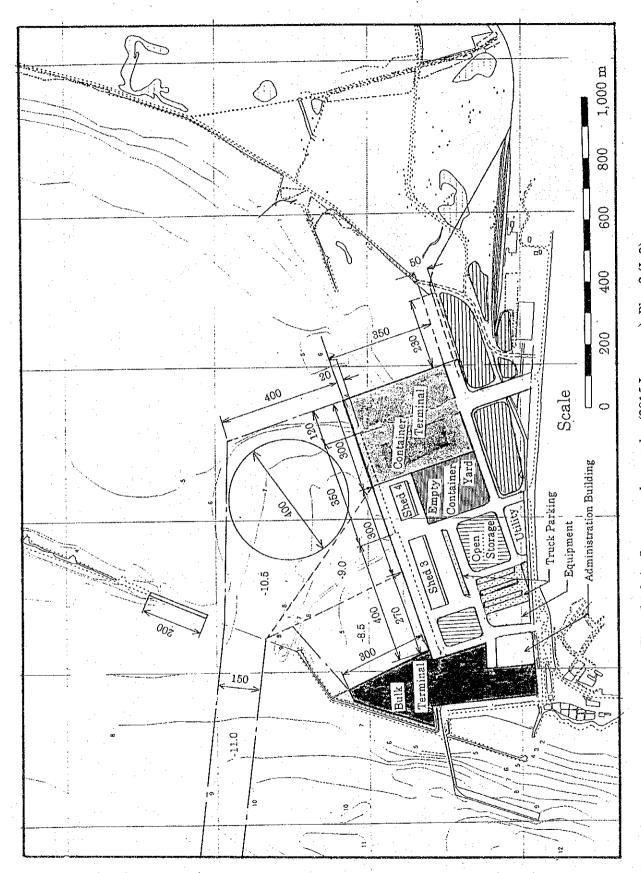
Long-term layout plan (2015, Low case), Plan-2 (L-2)
